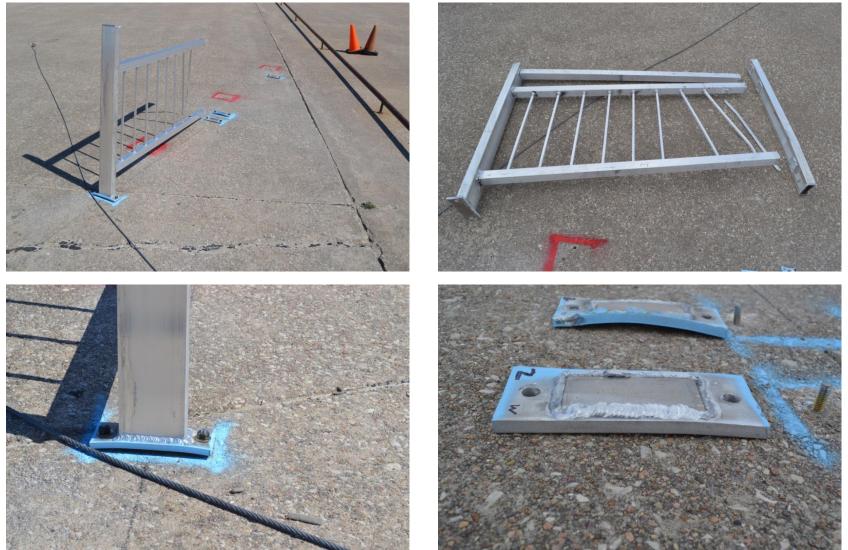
First Panel Damage, Run No. WIPR-1, Test No. WIPR-1-1
